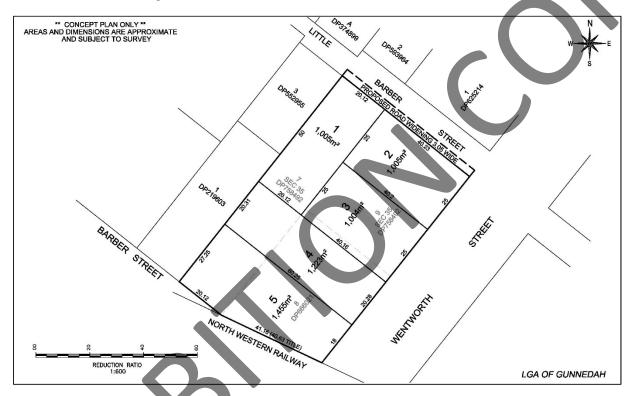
Plan of proposed Subdivision (refer attachment for full sized plan)
